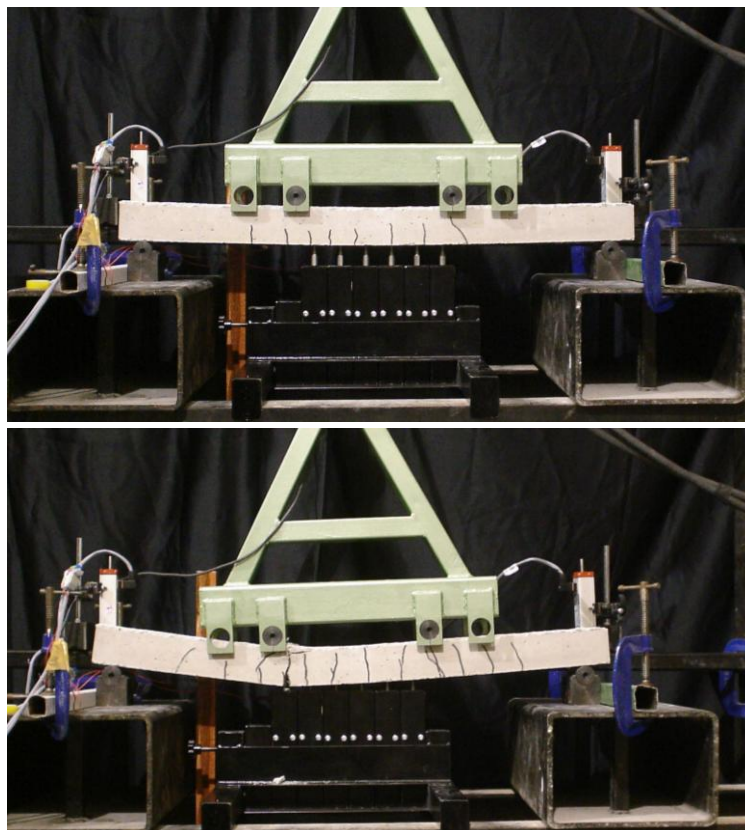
Cracking pattern of conventional reinforced concrete flexural element (*rc*) under bending
